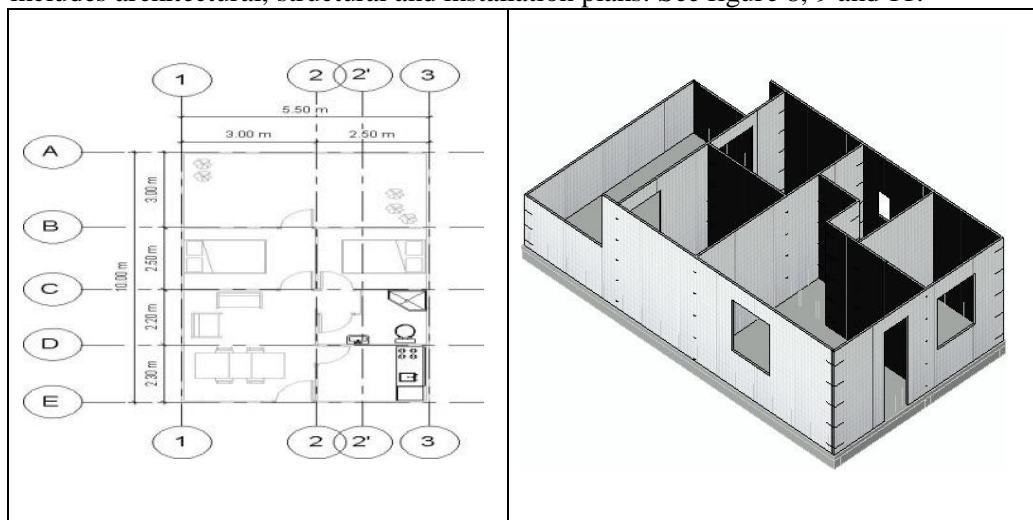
and 9 Architectural and 3D plans modelled in the BIM system
